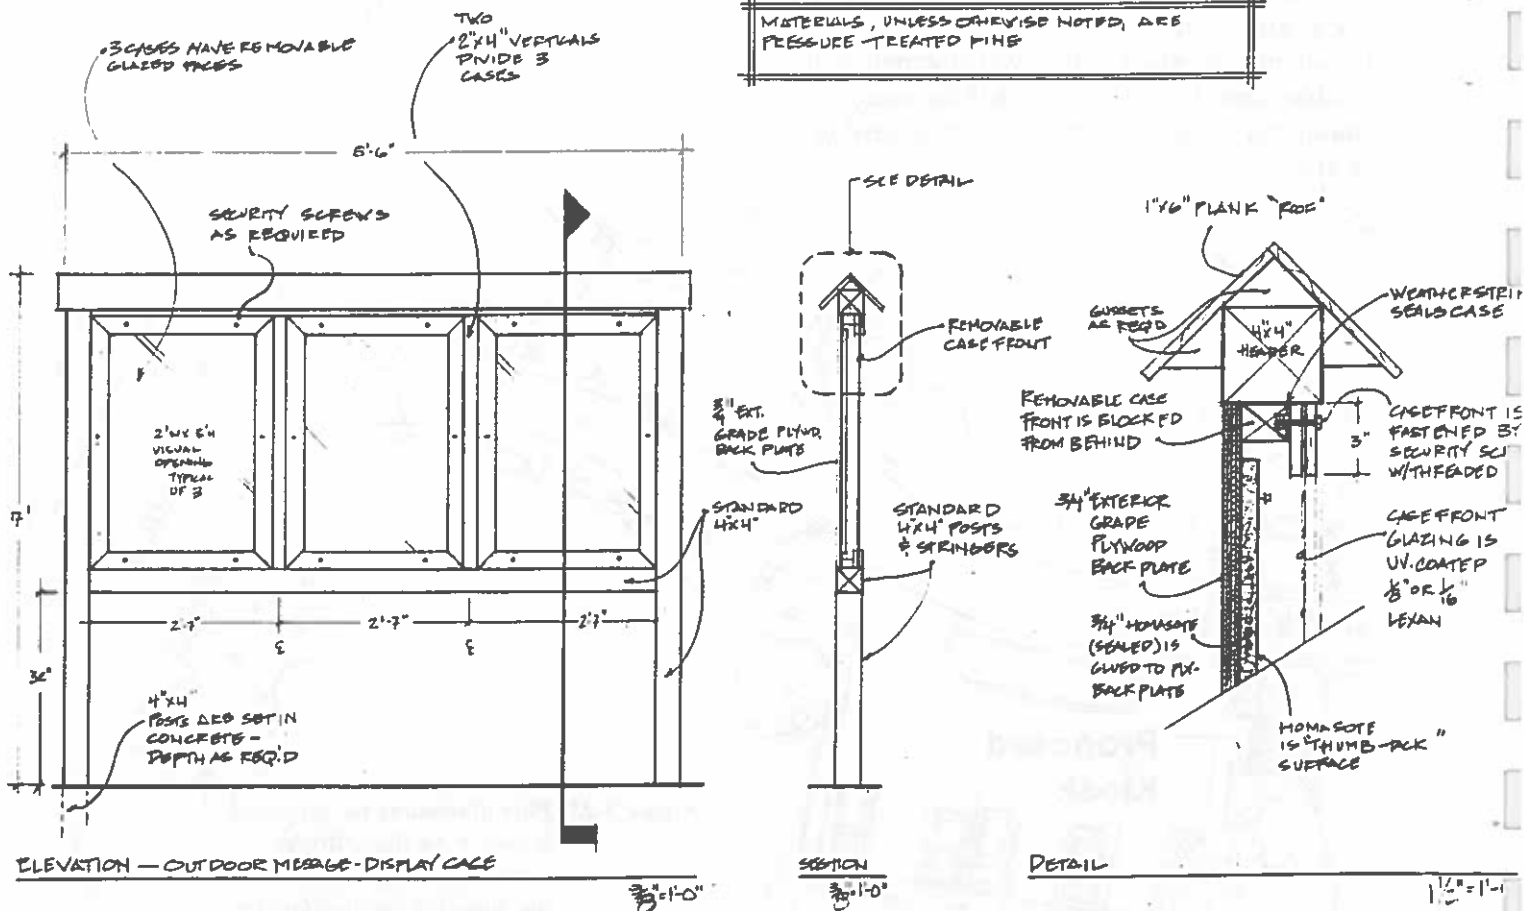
Plan and section illustrating how a simple informational kiosk could be constructed at each gateway pull-off
